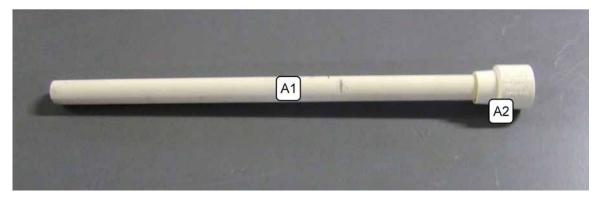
A Applying cleaner or glue to the joint surfaces before gluing.
